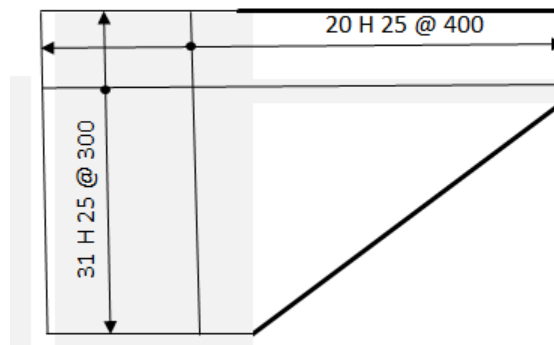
Reinforcement details of the wing wall for the left abutment
